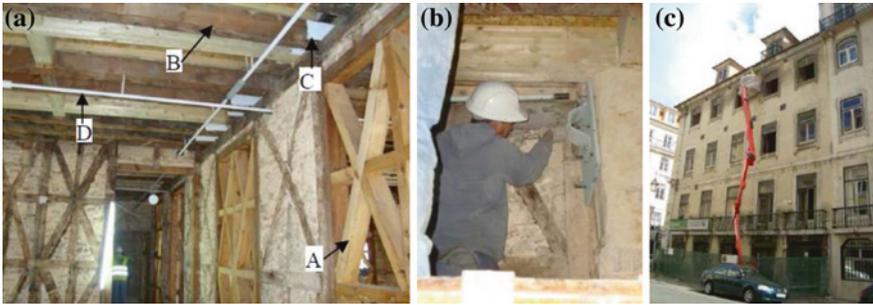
a A selective replacement of deteriorated wood bars of the *Gaiola*; B selective replacement of deteriorated wood bars of the pavements; C steel reinforcements to ensure continuity of the wood bars of the pavements over the supports; D cables connecting to the façades; b installation of an anchorage device of a cable; c preparation of a façade to place anchorage plates [24]
